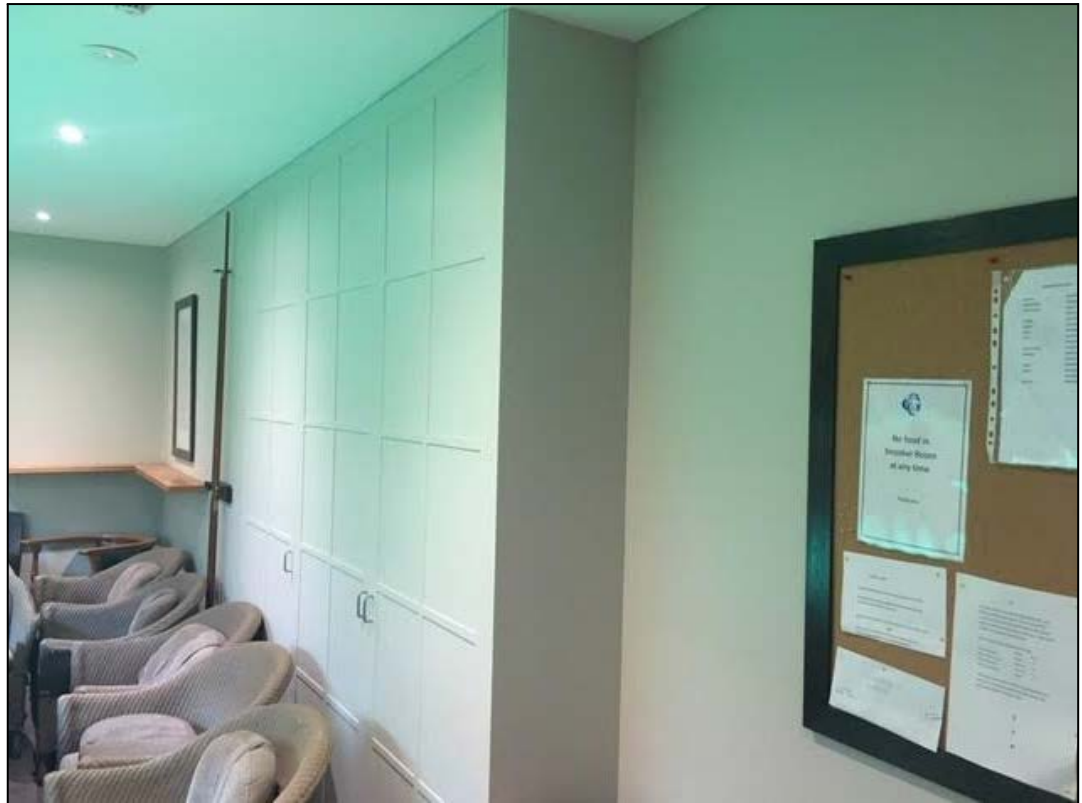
The wall between the snooker room and the bar will be removed. Again this wall is not structural.
